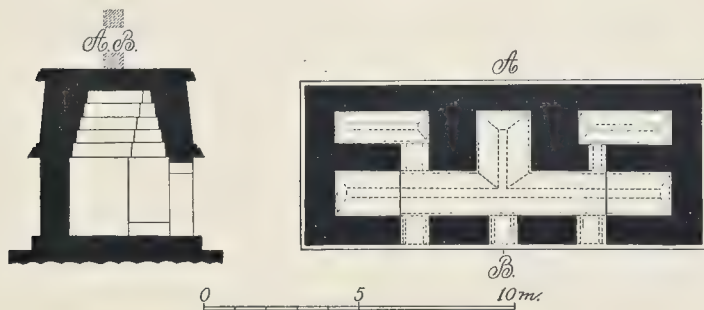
STRUCTURE 25: SECTION AND GROUND-PLAN (RESTORED).
